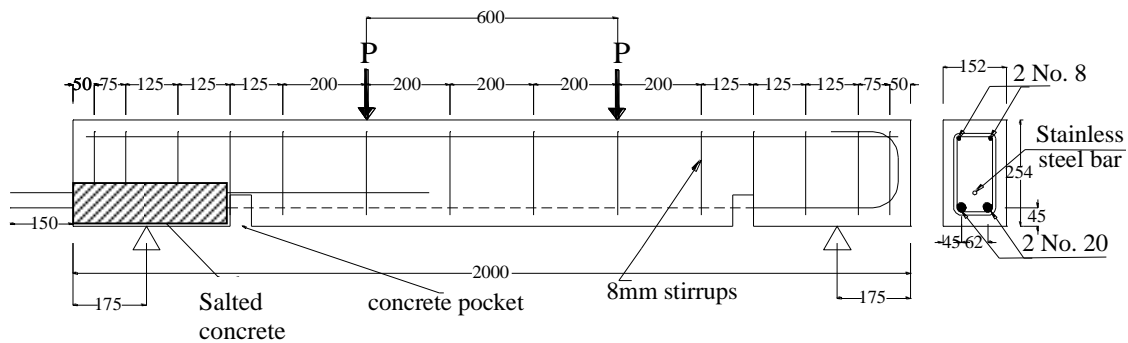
Schematic drawing of the 200 mm anchorage length beam, showing the salted concrete region as a hatched area.
